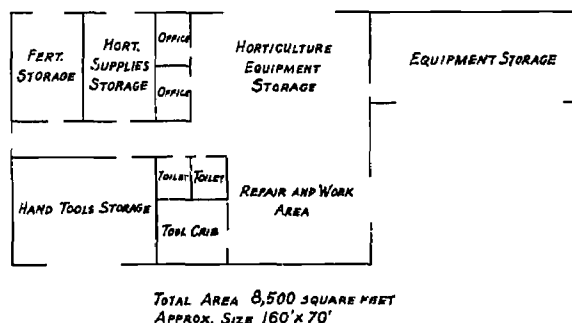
Suggested floor plan for horticulture equipment and storage building.
